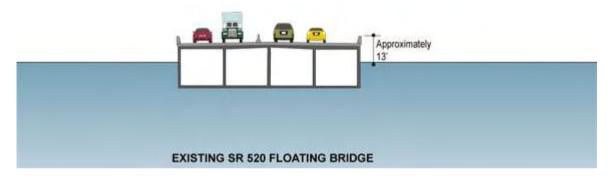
Existing SR 520 Floating Bridge, 18.29 m wide (note 13 feet = 3.96 m)
